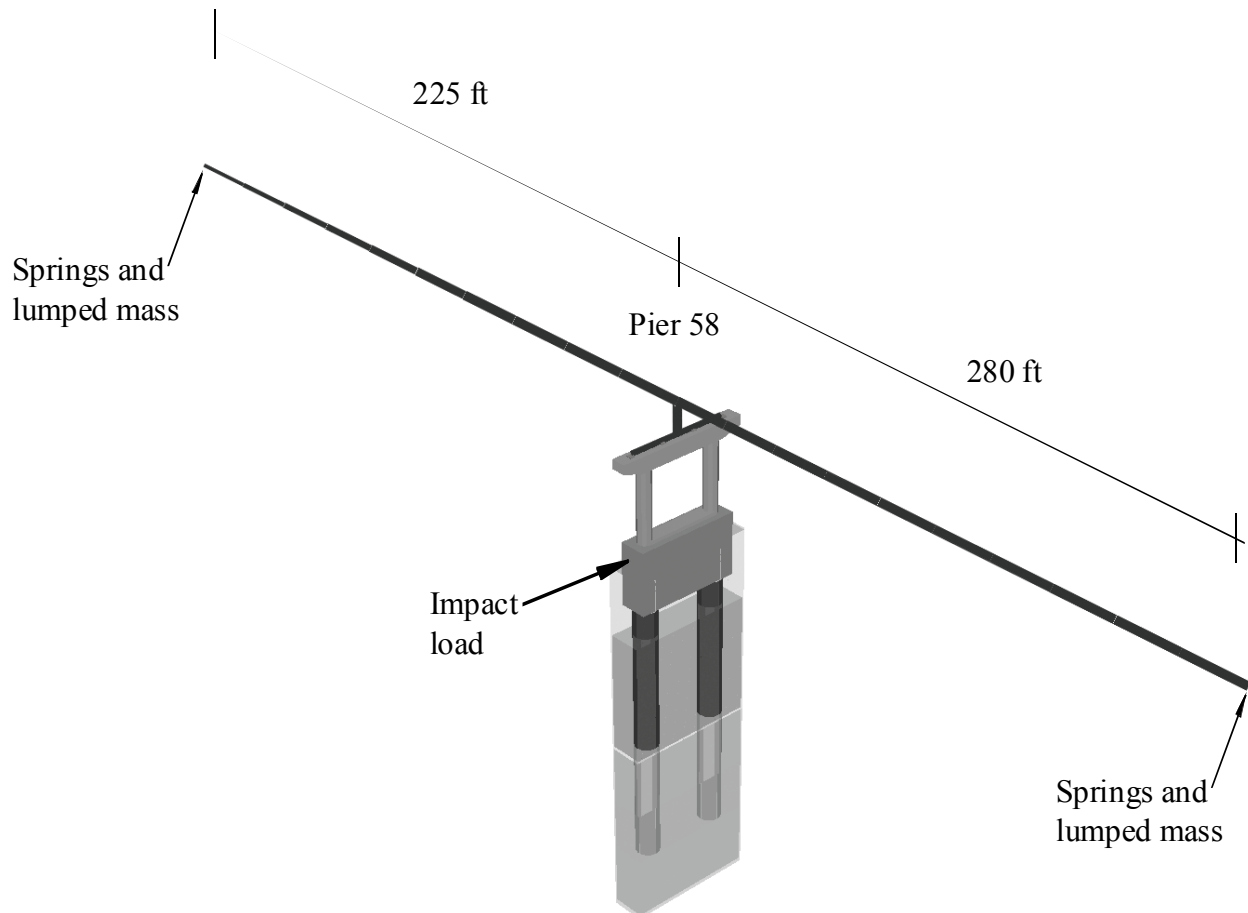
SR 20 at Blountstown, Pier 58 FE model
